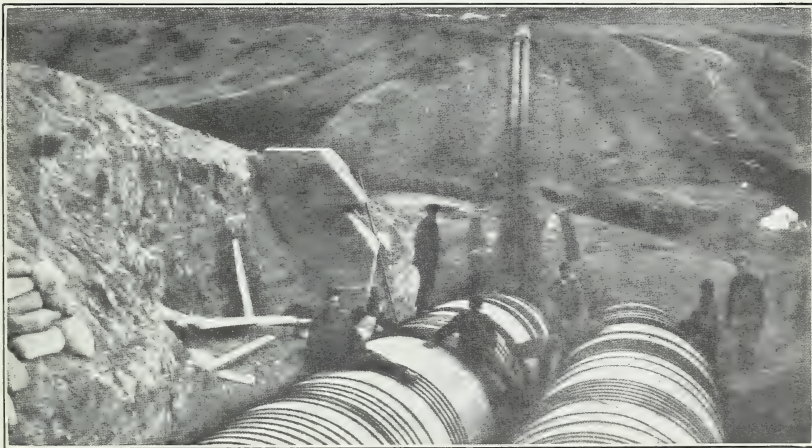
AN EXAMPLE OF TWIN LINE CONSTRUCTION.
